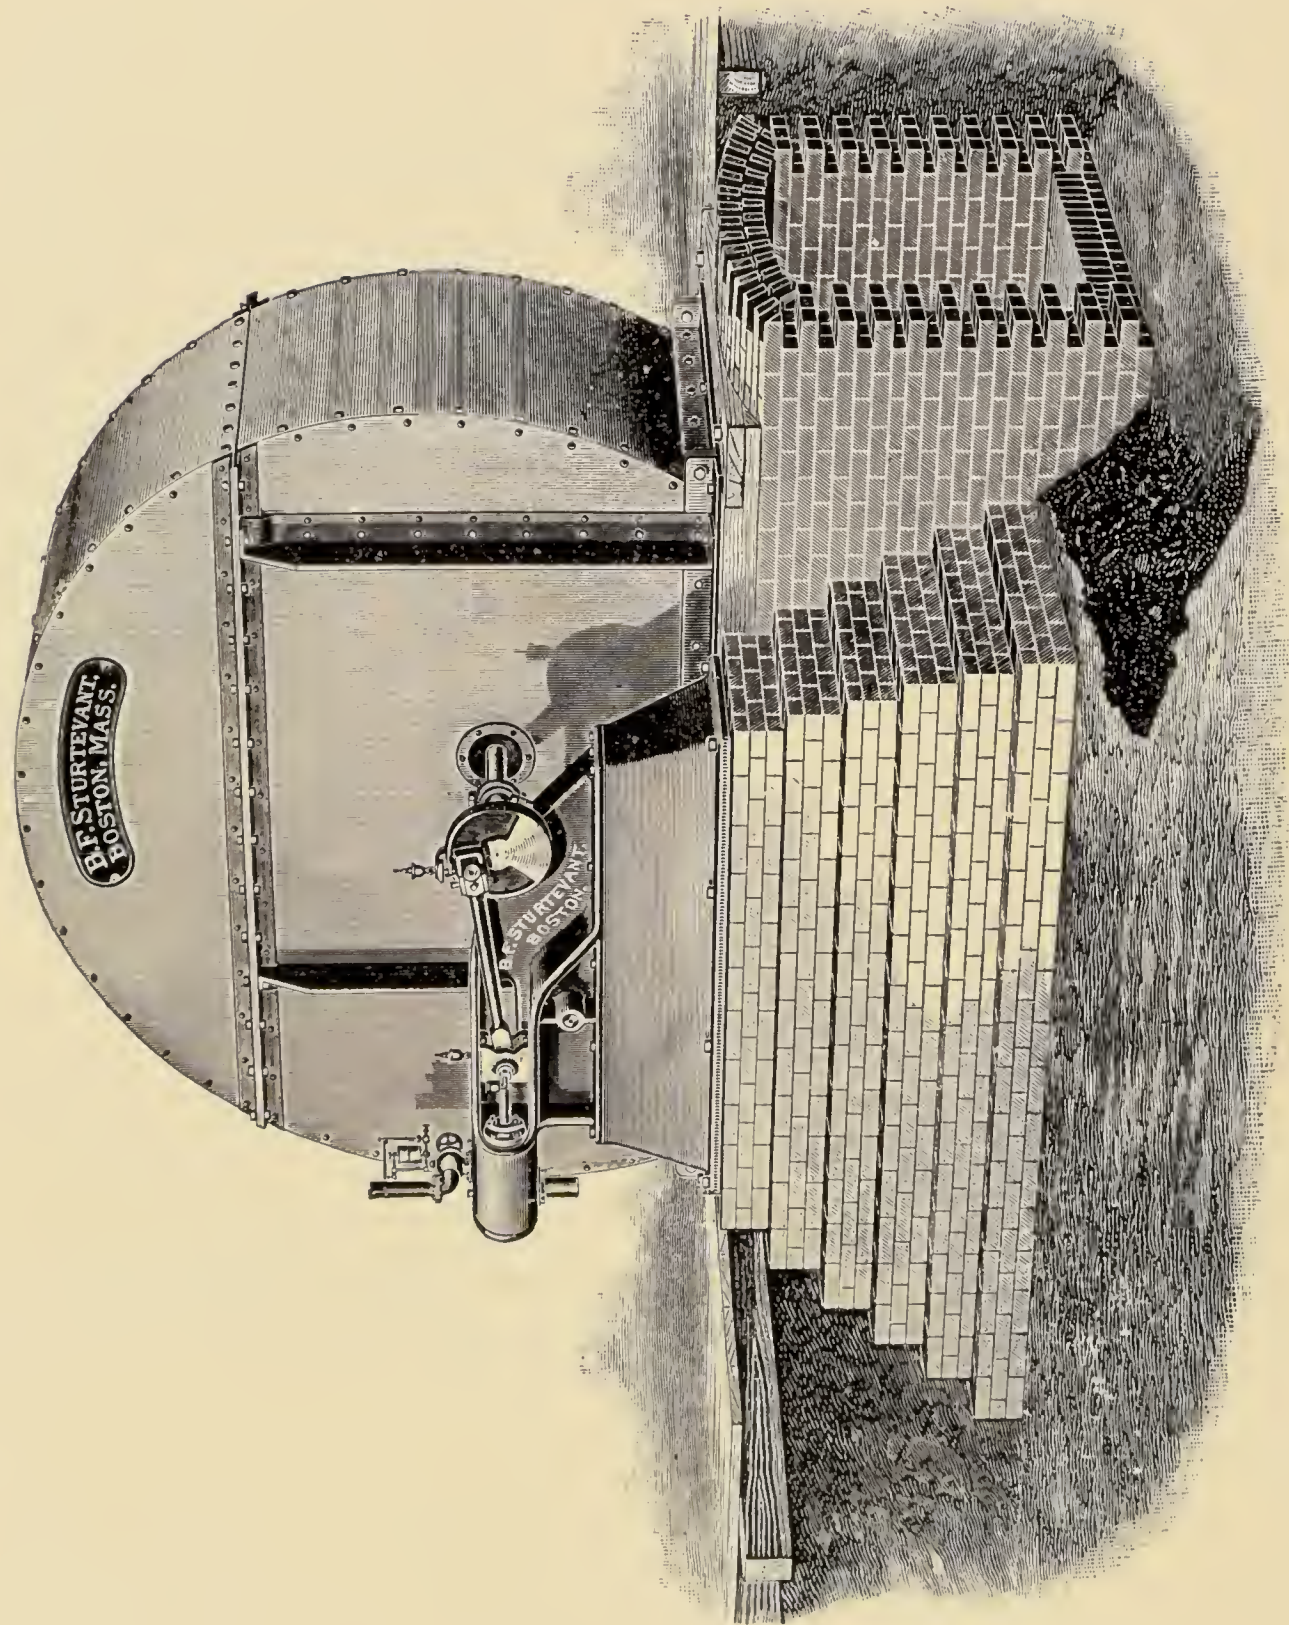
STEEL-PLATE STEAM FAN WITH THREE-QUARTER HOUSING AND HORIZONTAL ENGINE.
